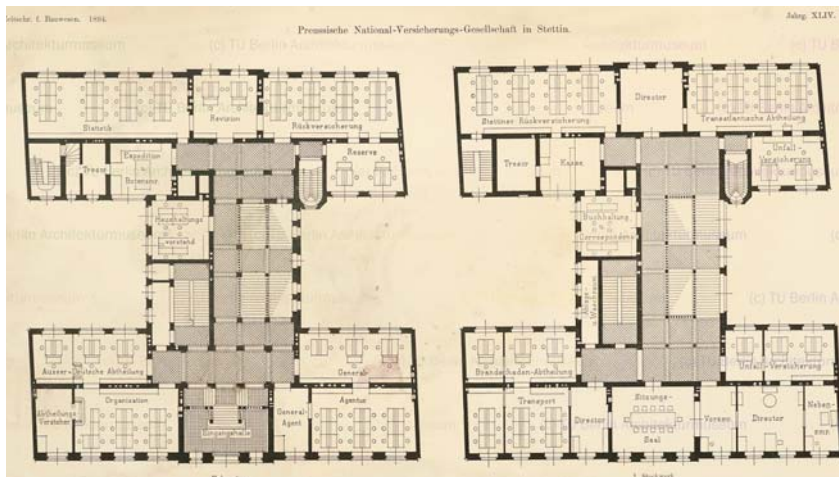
The floor layout plan of the ground and the first floor 1894. Source: [5, p. 55]
